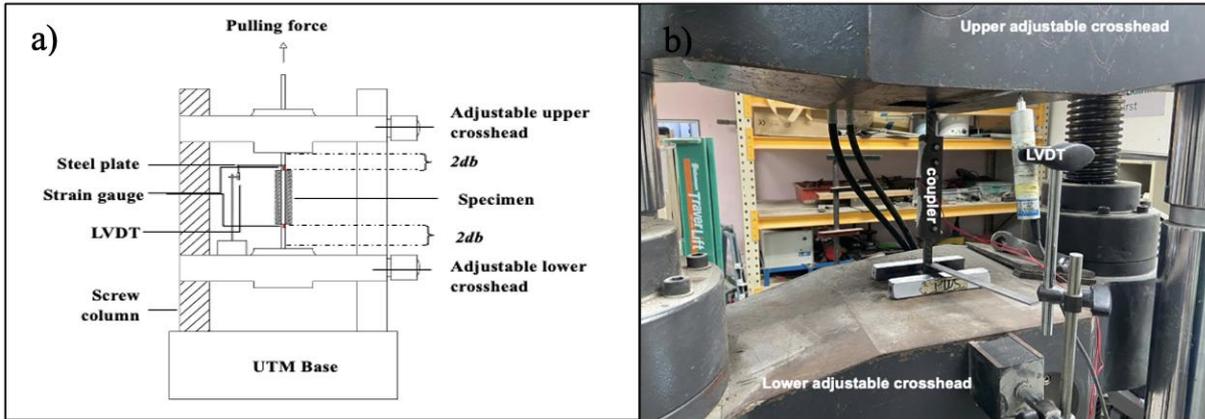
M3 setup (a) Schematic drawing; (b) Experimental testing
